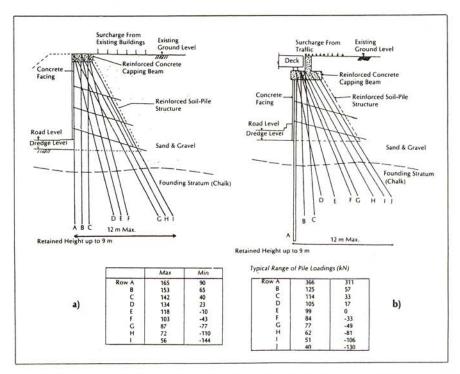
In situ reinforcement for road widening project, Dartford, London.
